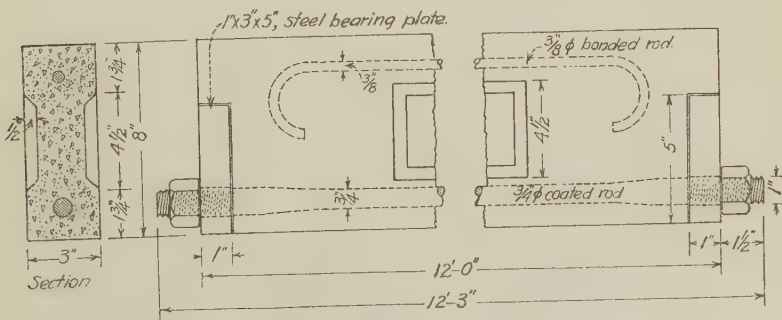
DETAIL OF 3 X 8 X 12' 0" HAYDITE JOIST
